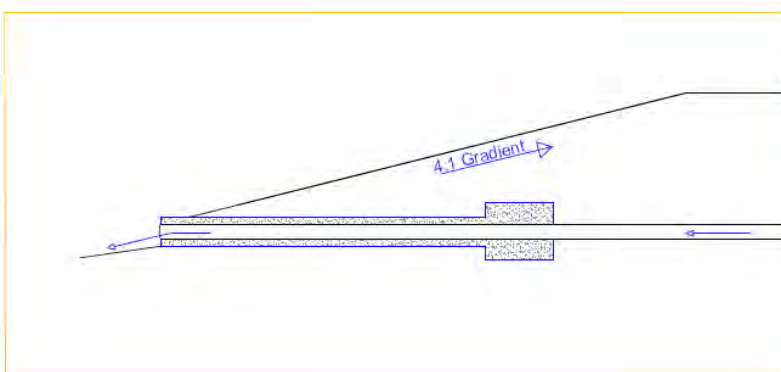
Schematic cross-section showing a seepage sleeve drain on an outfall section of the DB pipe.
